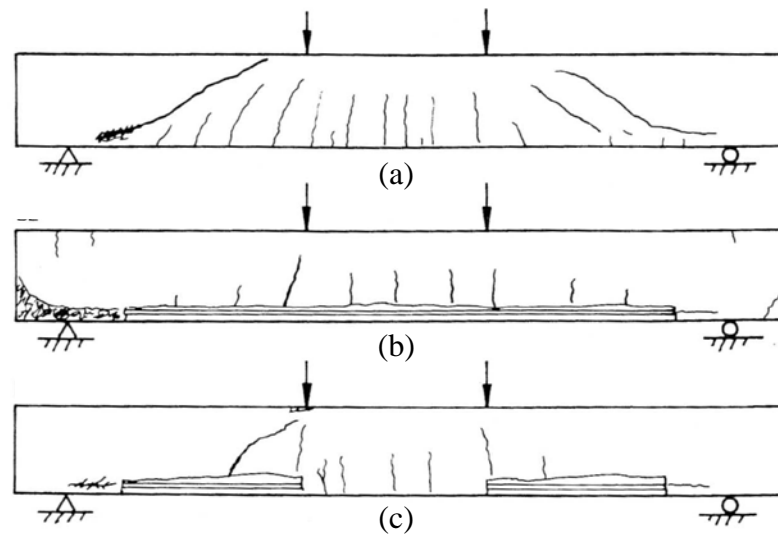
Crack Patterns of Specimens Designed to Exhibit a Shear Failure: (a) Control, (b) and (c) Specimens with Exposed Flexural Reinforcement (Cairns 1995).
